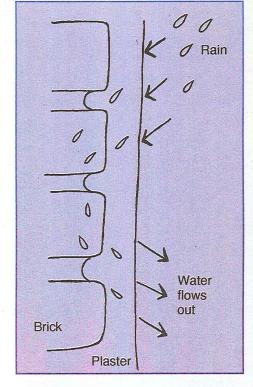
Water movement through limebased plaster. This drawing shows how exterior plaster keeps water from being trapped in a brick wall.
